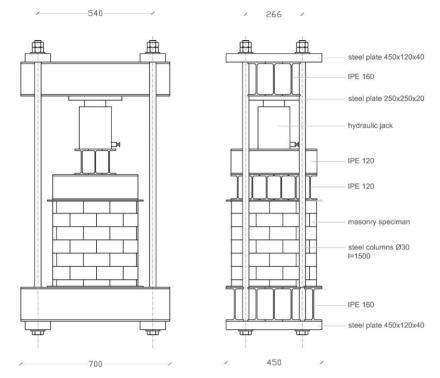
Scheme of the removable loading machine used for the compression and shear tests.
